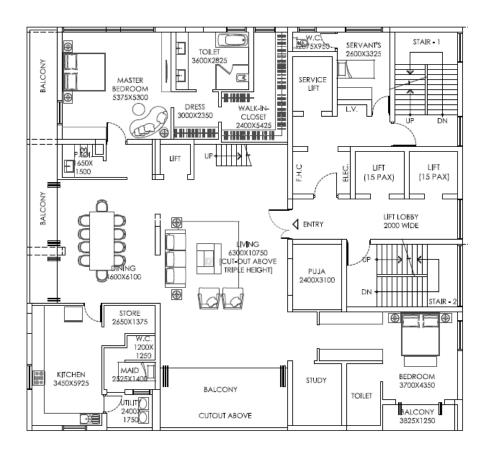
A Architectural Typical Floor Plan of G+24, G+30 and G+36 Storied Buildings
